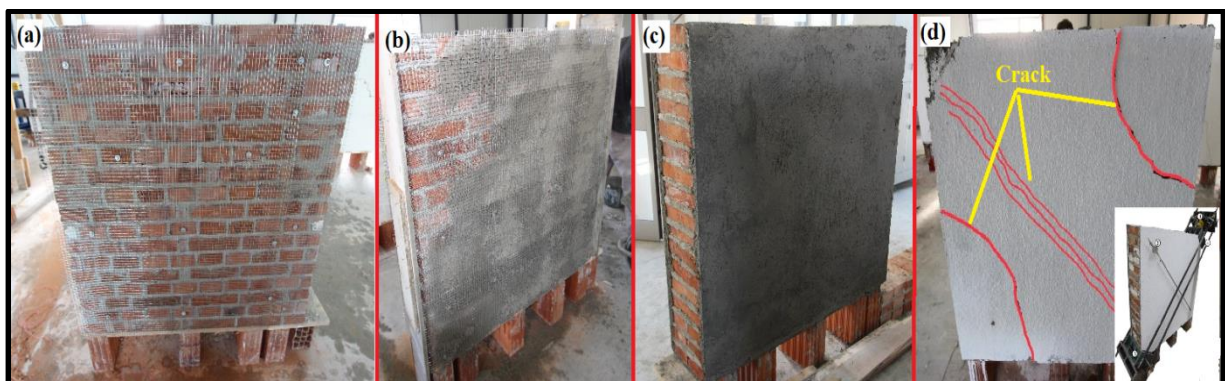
Reinforcement of masonry walls with ferrocement jacketing (a- installment of the mesh, b- application of the first plaster layer, c- application of the second layer, d- the failure mode of FC-strengthened panels) (Mustafaraj et al., 2023)
